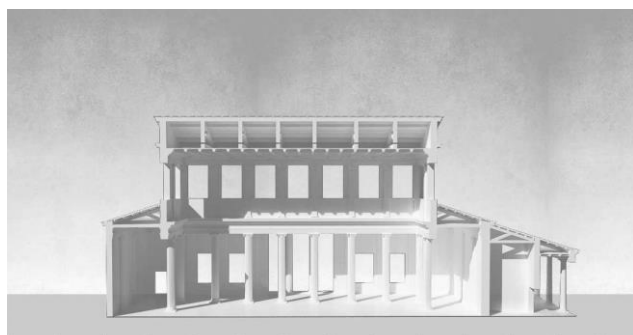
Reconstructive hypothesis of the Basilica: longitudinal section
